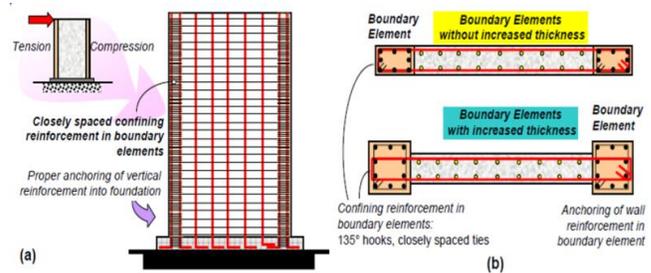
Layout of Main Reinforcement in Shear Wall as per IS:13920:1993
